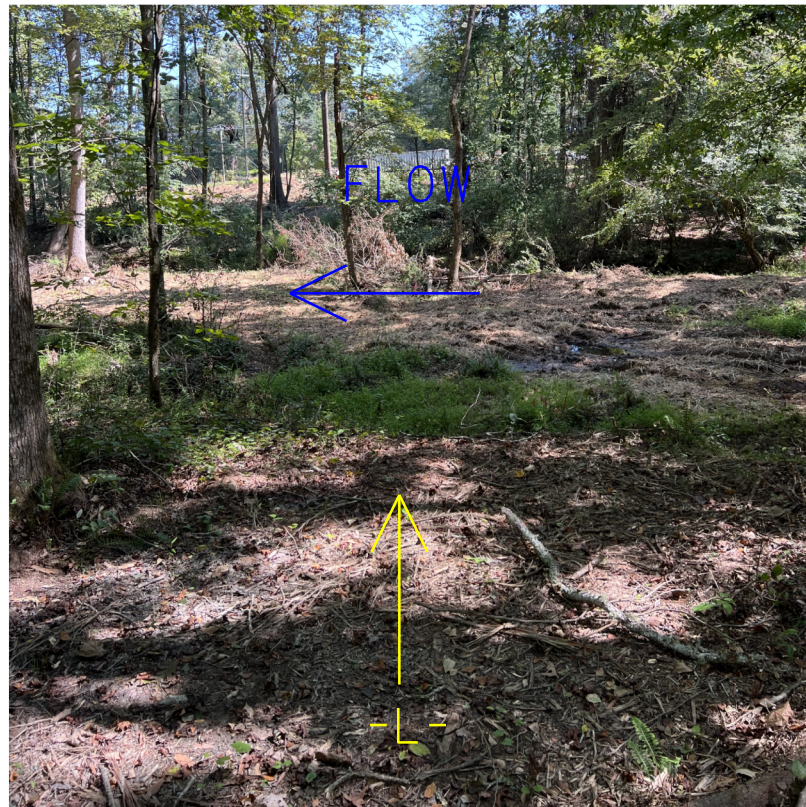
VIEW NEAR END BENT NO. 1, FACING UPSTATION
